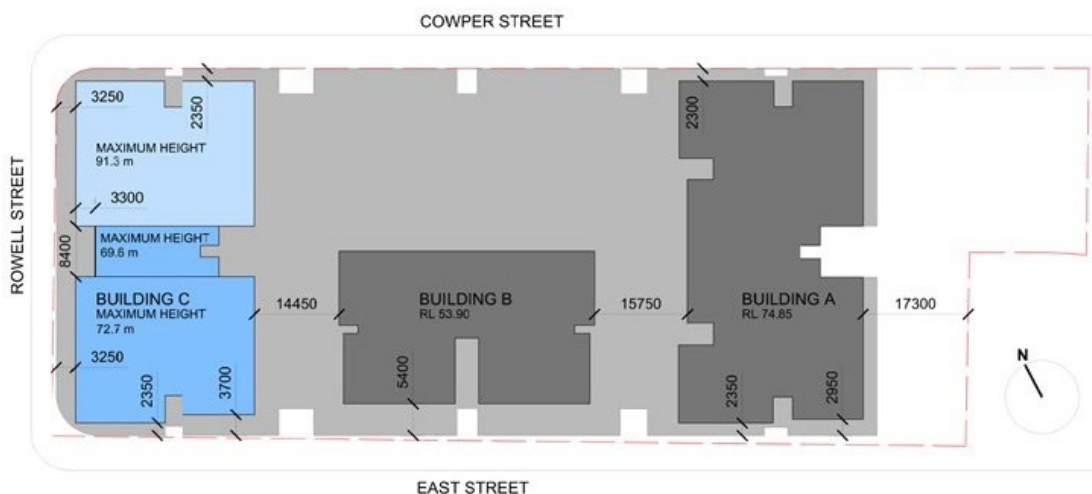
Building C Envelope, Heights and Setbacks
